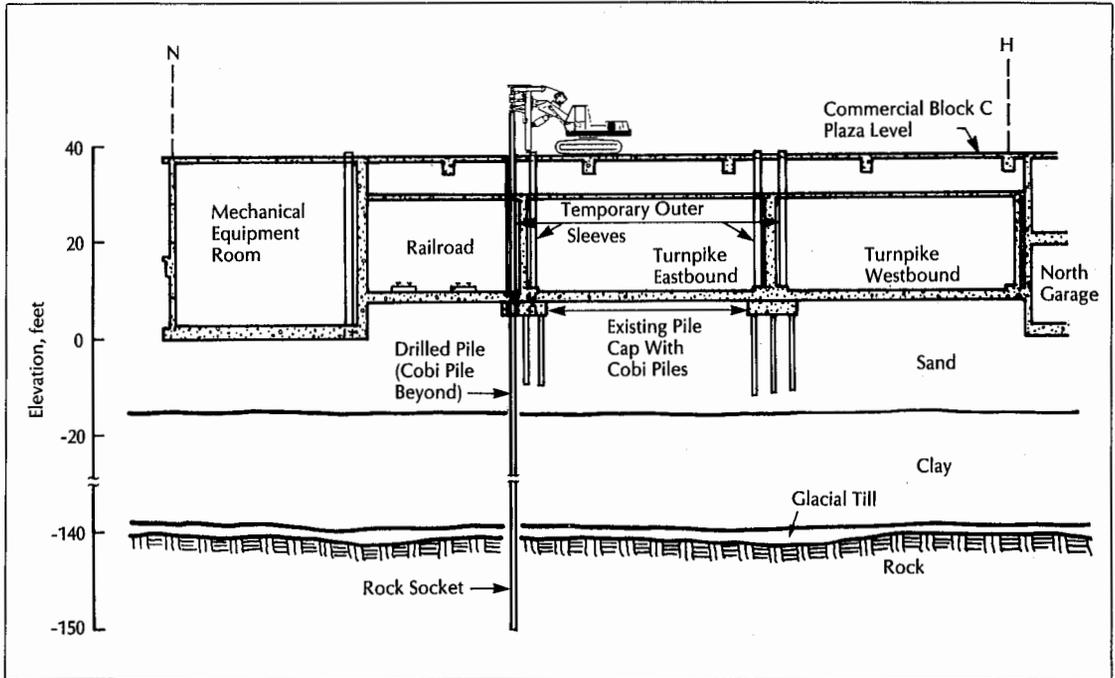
Section through the turnpike and railroad right-of-way and the mechanical equipment room showing drilled pile installation through temporary outer sleeves.
